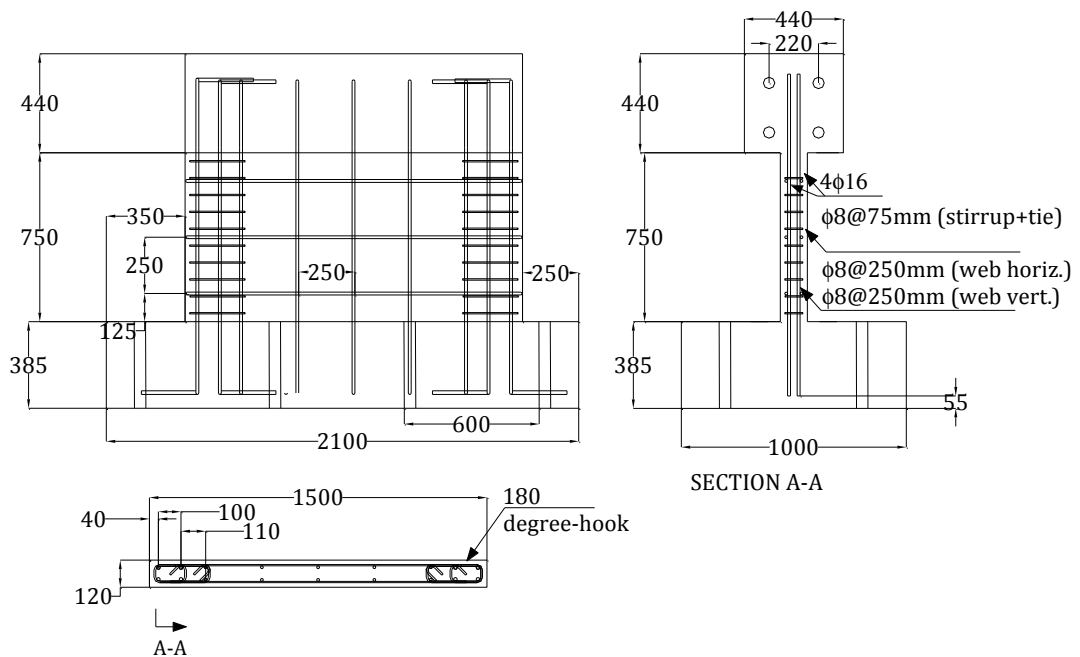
Geometry and wall reinforcement of specimen T1-S2.
